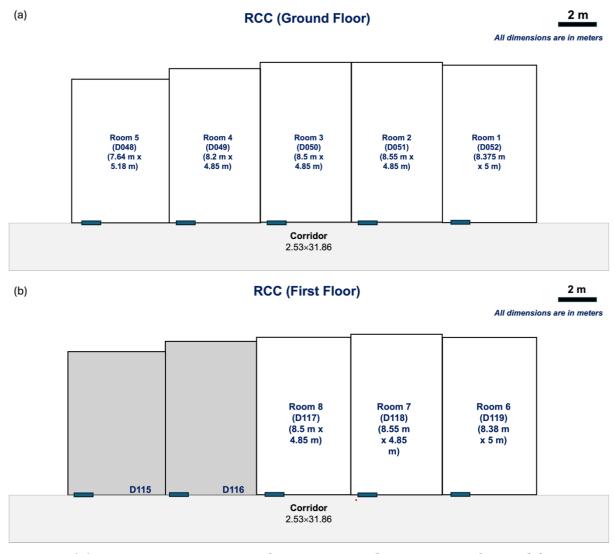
(a) Layout and numbering of rooms on the Ground Floor of the RCC building. (b) Layout and numbering of rooms on the First Floor of the RCC Building.
